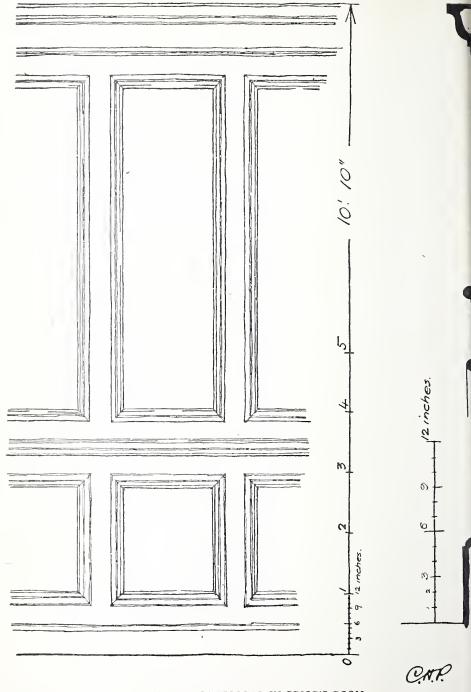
PLATE VI.—PANELLING IN PRIOR'S ROOM.
